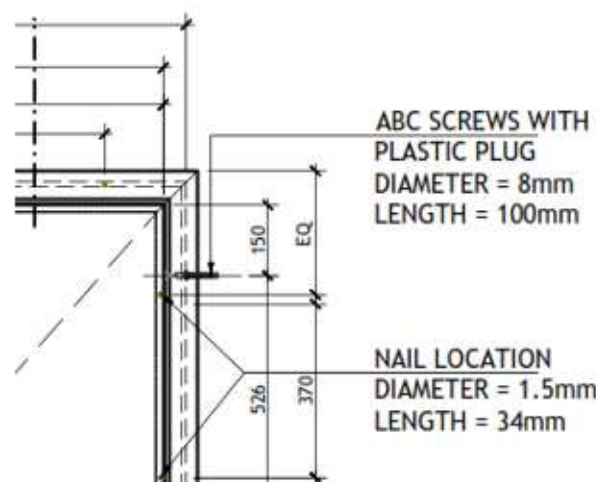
door frame and architrave fixing for both door 1 and door 2.
